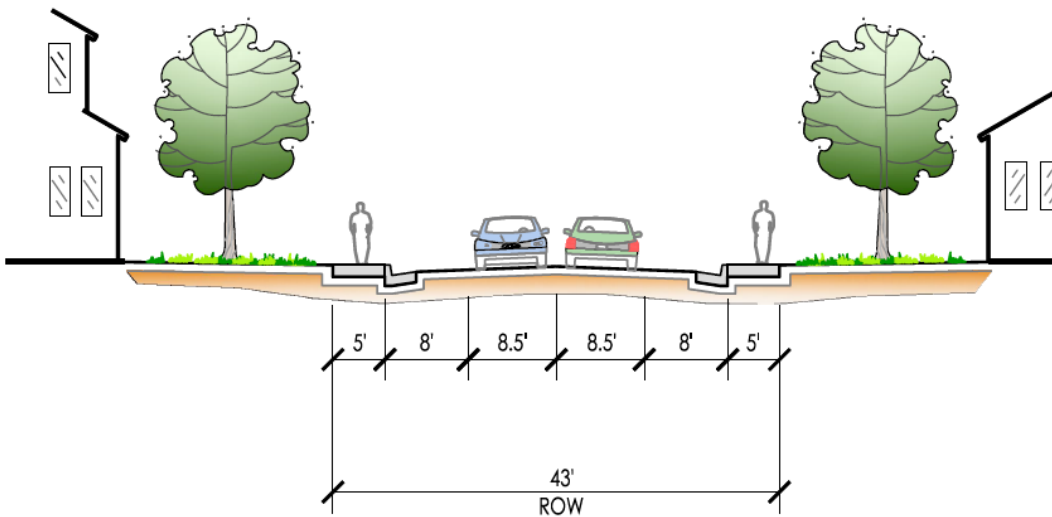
Residential Street w/ Attached Sidewalk (Section J2)
